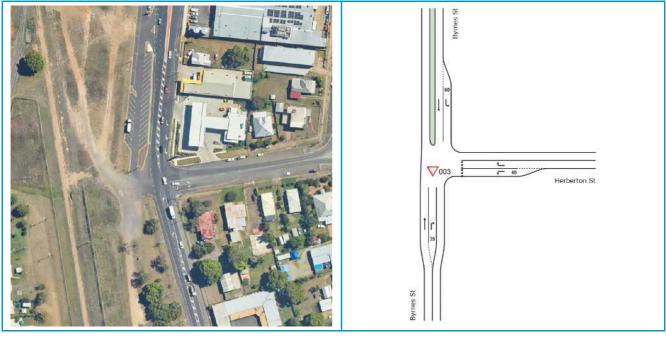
Byrnes Street / Herberton Street – Intersection Form
